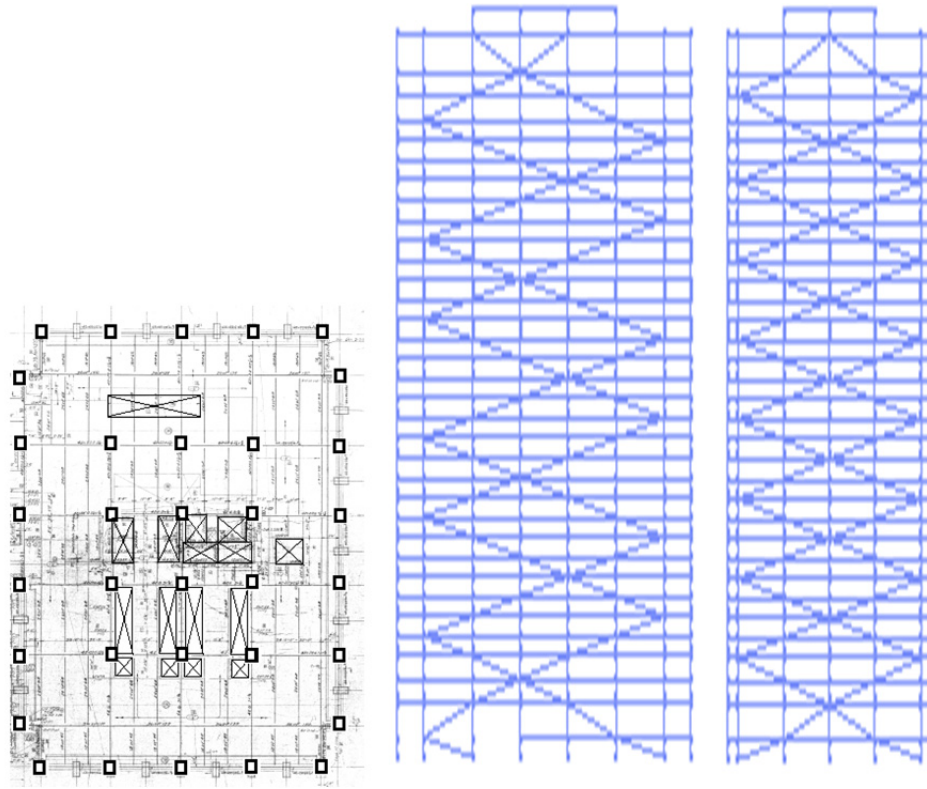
Plan view and exterior elevations of the case-study building with trial placement of damper.
